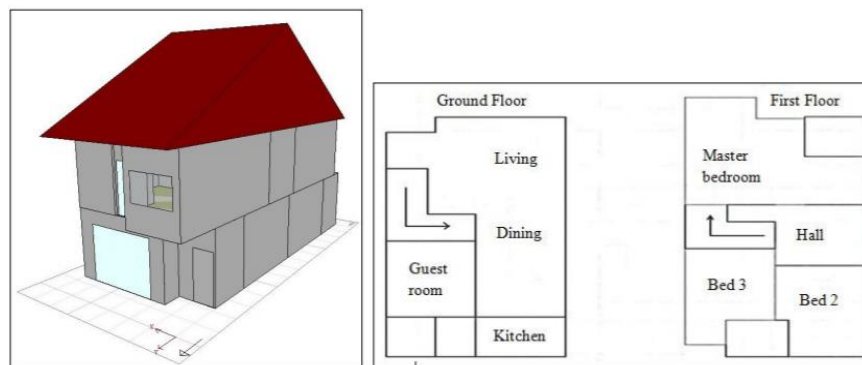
House indoor and outdoor plan (Jamaludin et al., 2015)
